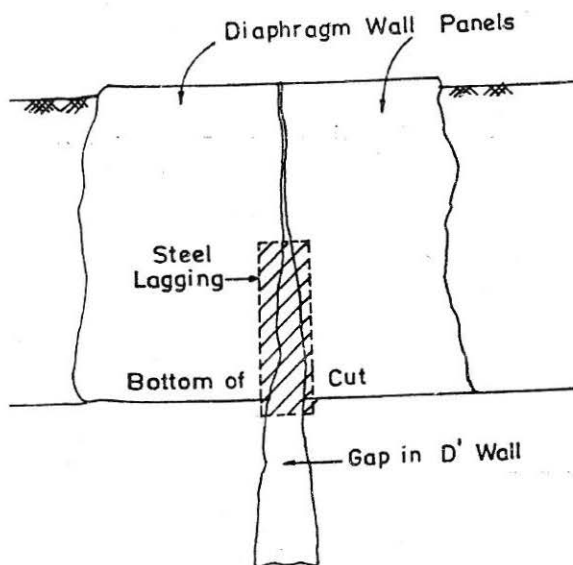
Steel Laggings to Bridge Discontinuity in Diaphragm Wall
